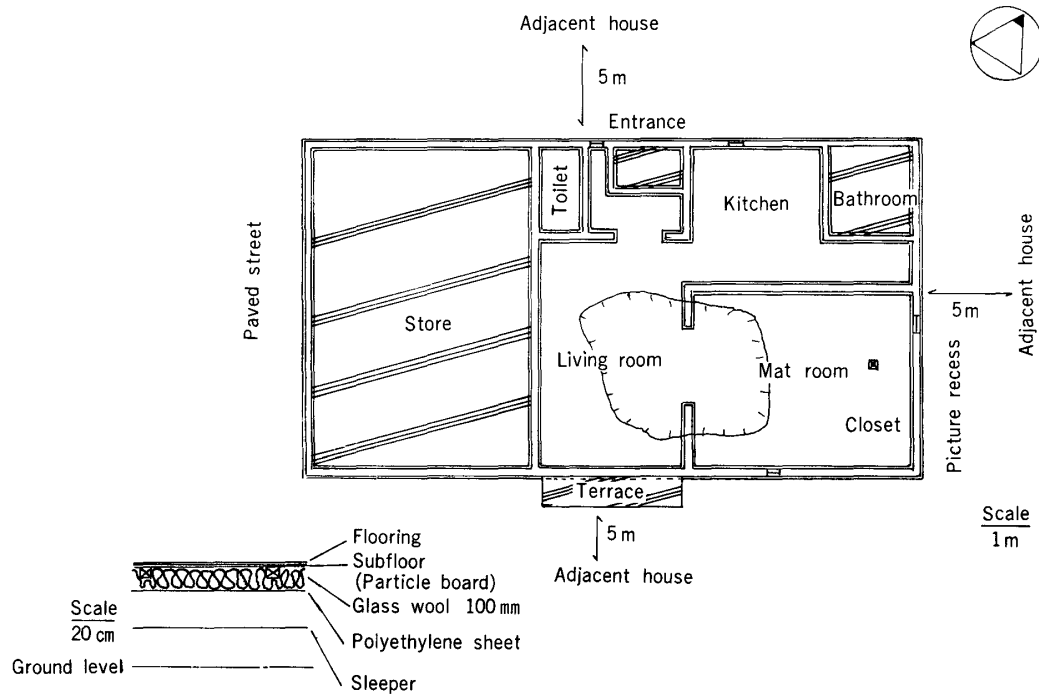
The foundation plan and the details of the floor constitution (Case 5).
